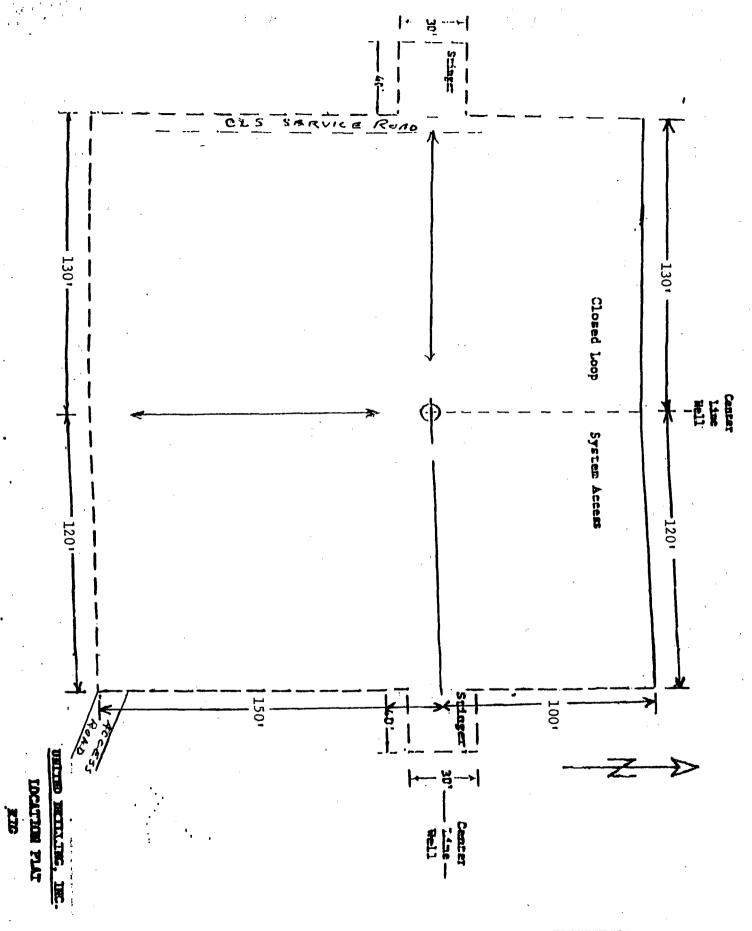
EXHIBIT "D" SEELY OIL CO. Carper Sivley Federal, Well No. 9 Pad & Pit Layout
